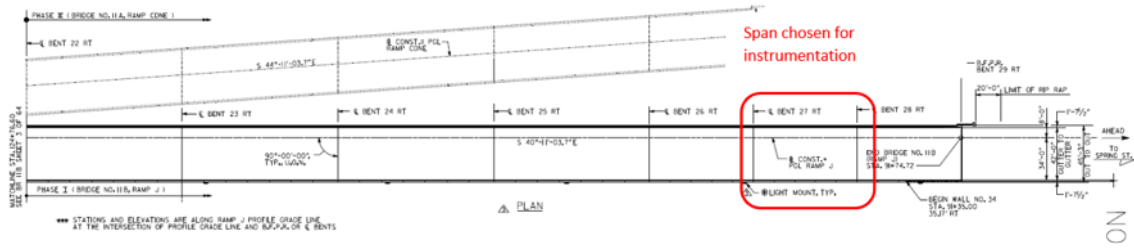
Engineering Drawing. Plan view Span 27RT, Bridge 11B
